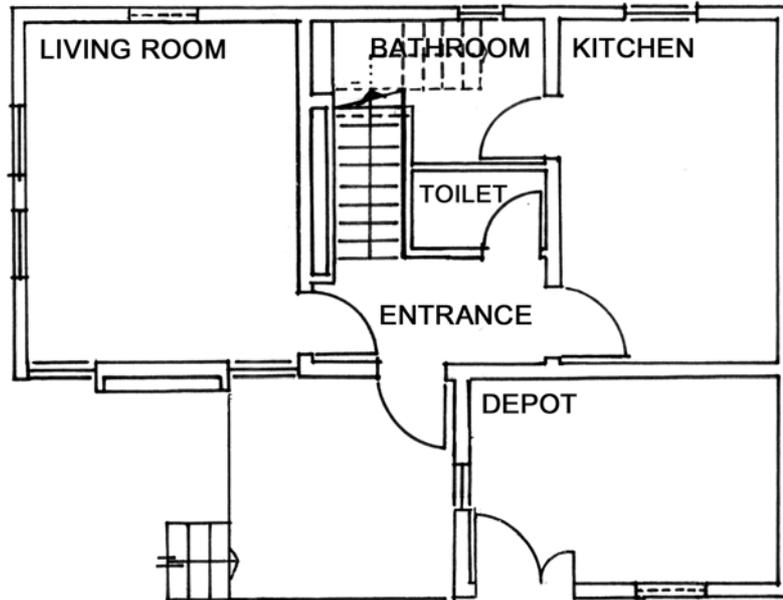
Plan of types S₂ and S₂' dwelling (house with southern entrance); Scale 1/100
